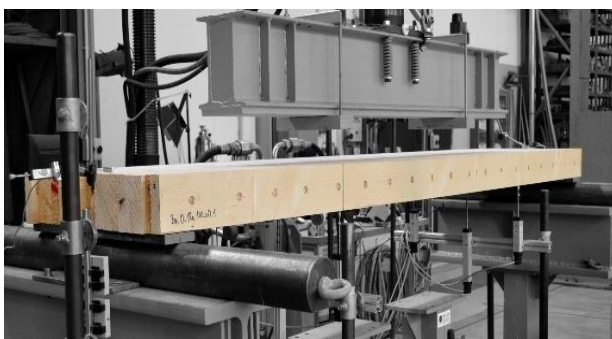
AF dowelled-laminated beams [U Liverpool].
